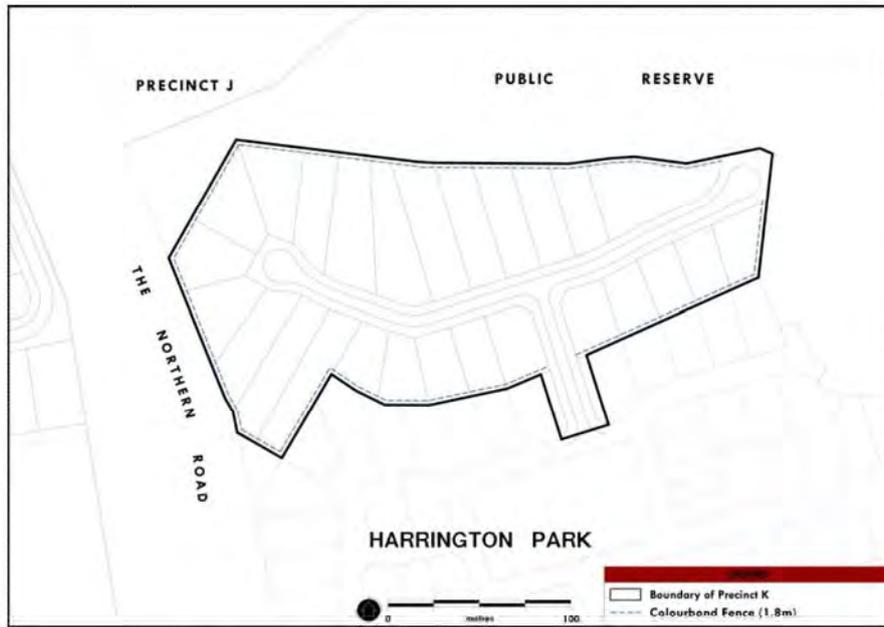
Harrington Grove Precinct K Estate Fencing Plan
